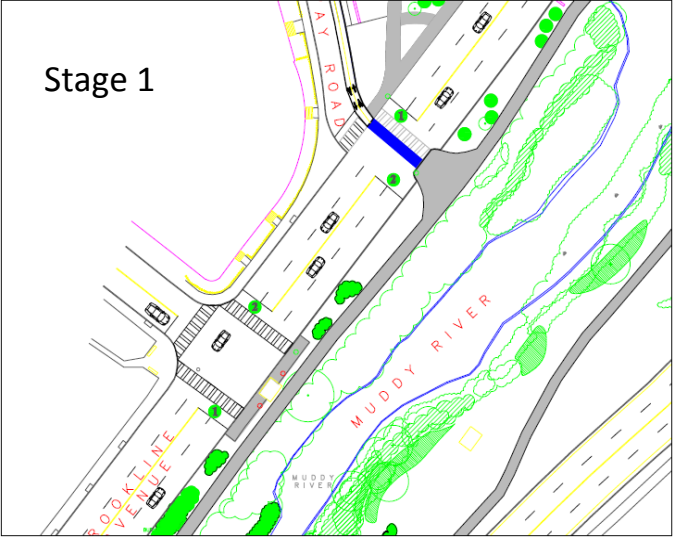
Light Stages for Brookline Avenue, Parkway Road, and Aspenwall Road
